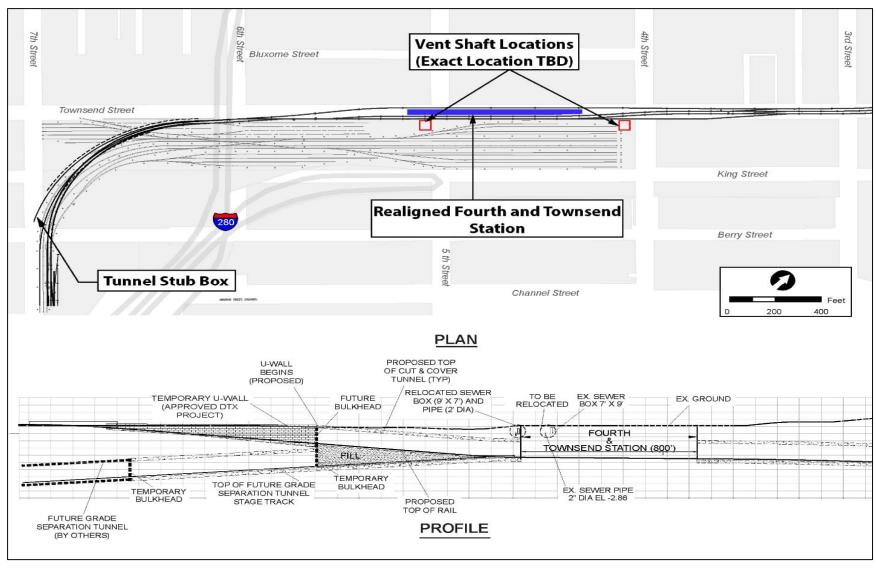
Approved Fourth and Townsend Street Station Plan and Profile to be Modified
